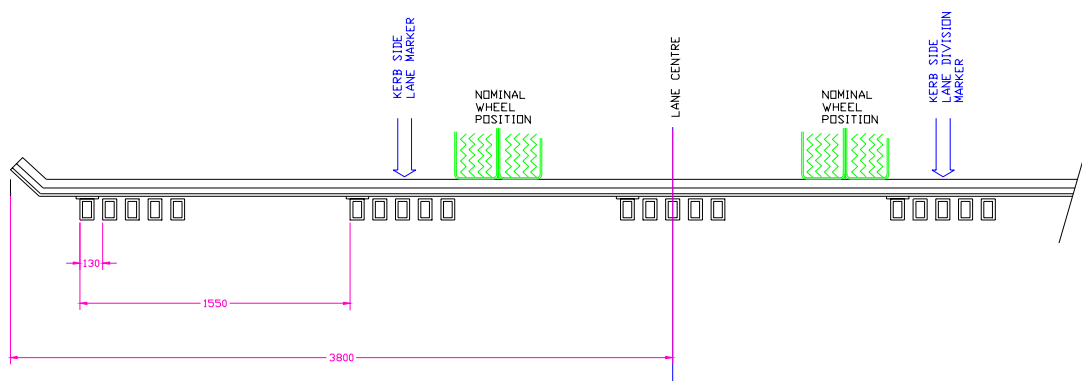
Elevation of MBEJ and Nominal Test Truck Position (Taree)
